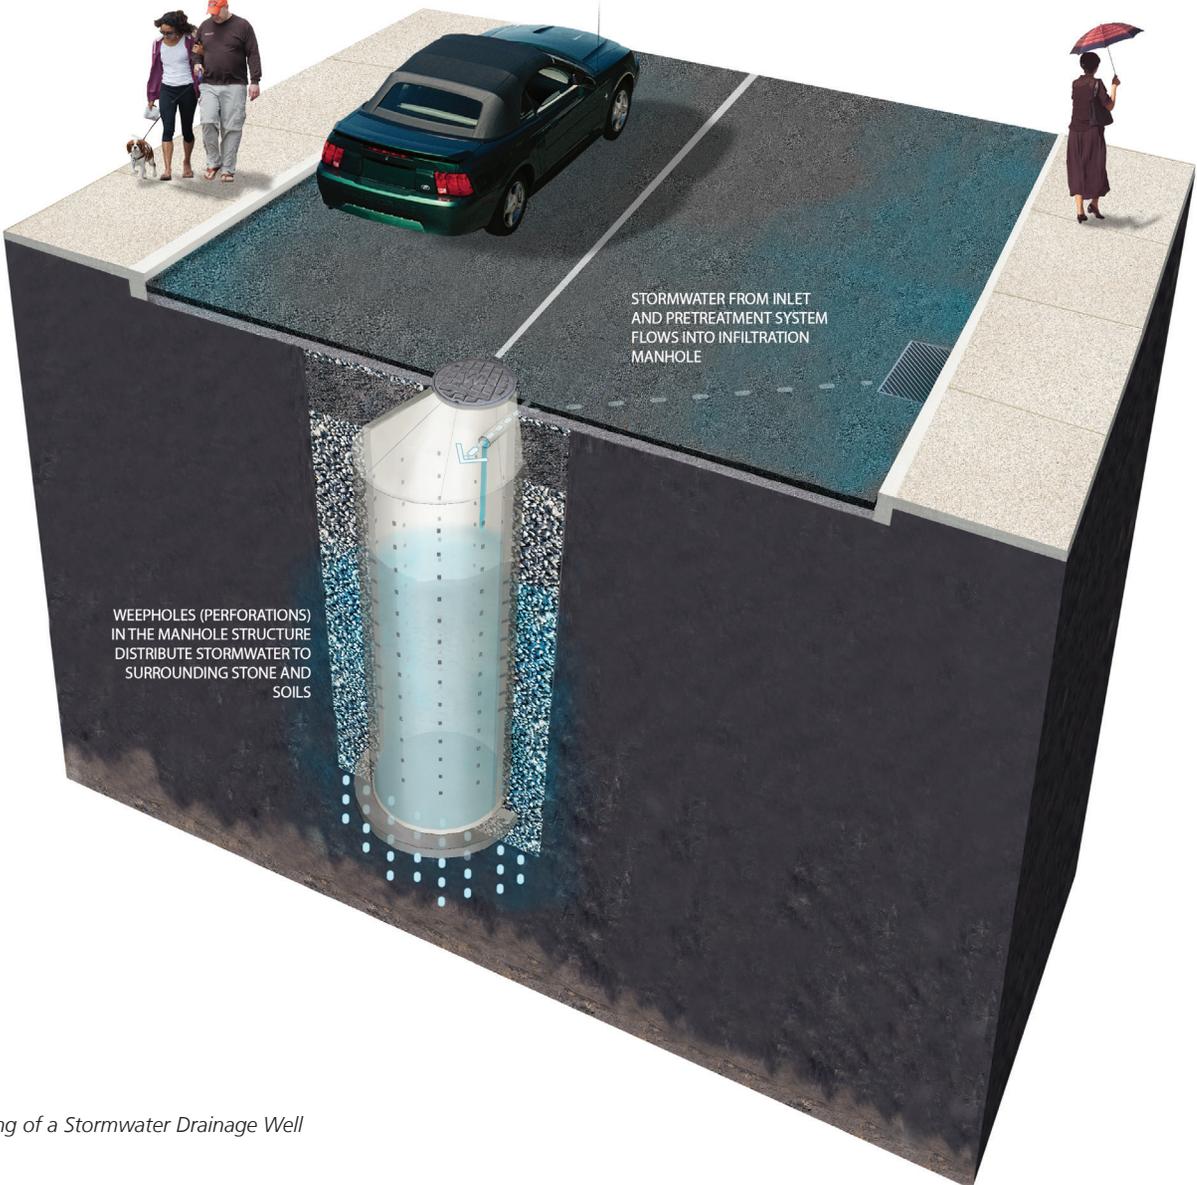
Concept Rendering of a Stormwater Drainage Well
